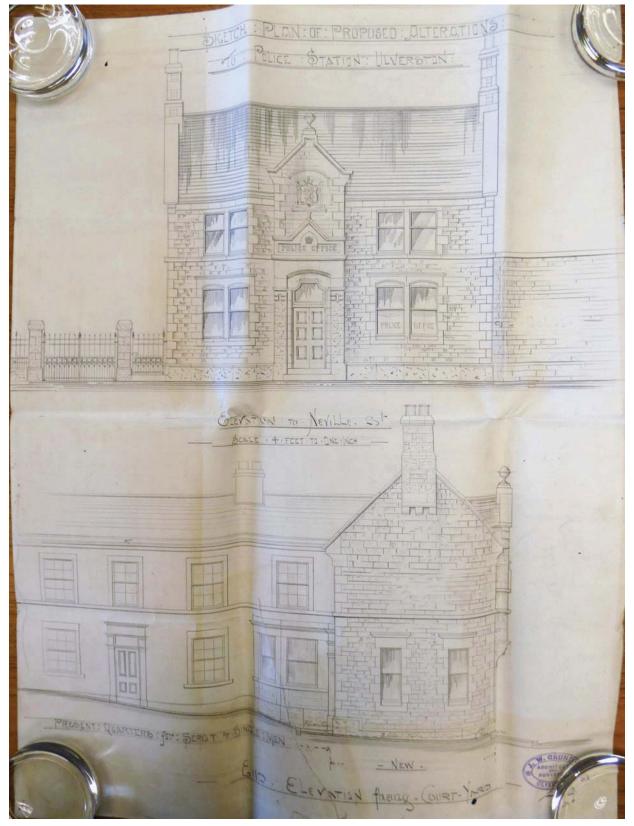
Elevation drawings for the new Police Station (CAC(B) Z/1086 1882-1888)
